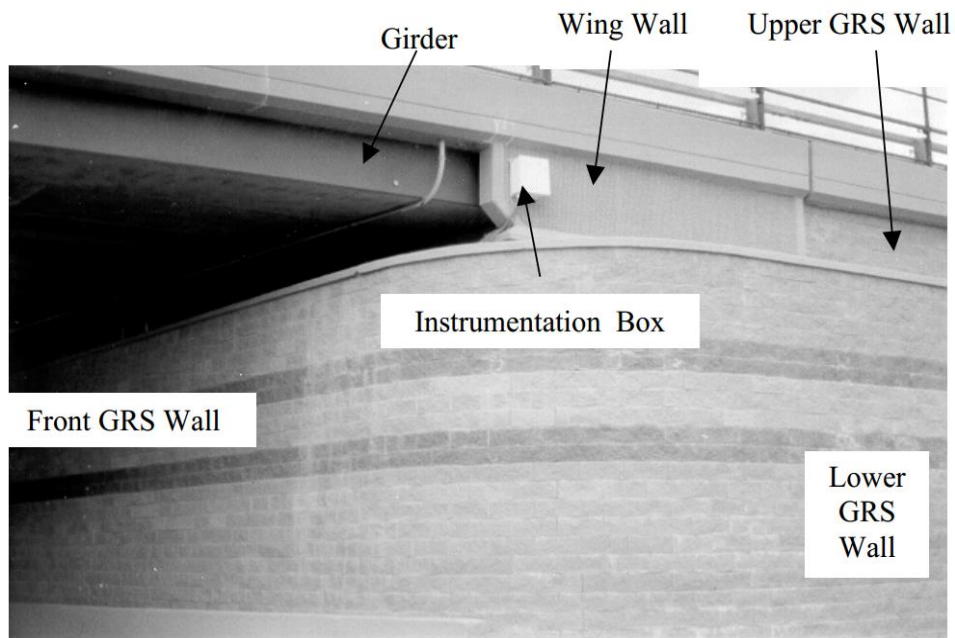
GRS wall as bridge abutment (Abu-Hejleh et al. 2002)
